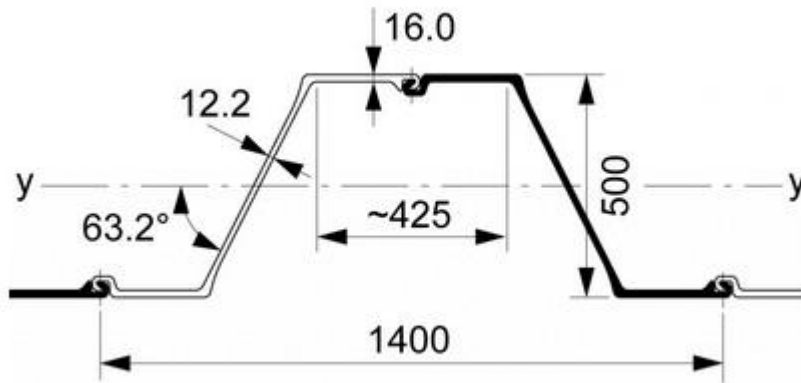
Nominal dimensions [mm] of a section of “AZ38/700” sheet pile viewed end-on.
